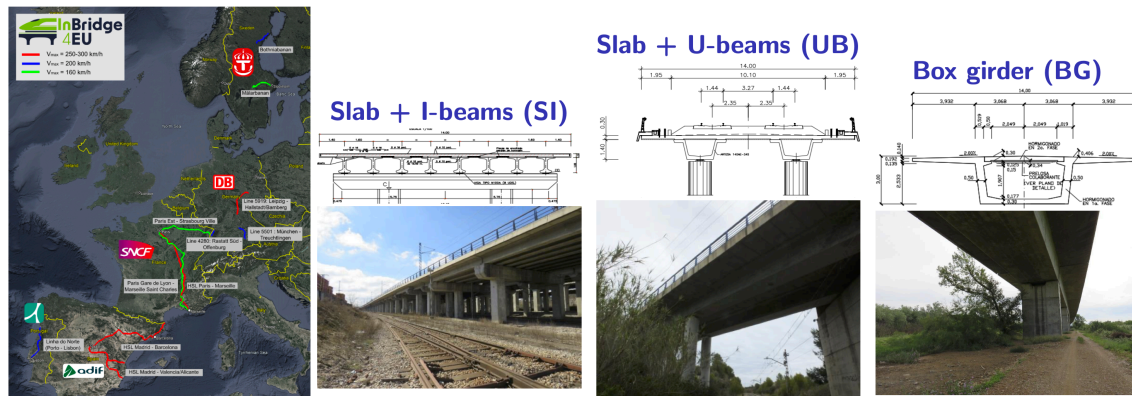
European railway lines studied for InBridge4EU project (left); Some typical structural types for double track bridges subject to detailed studies (right).
